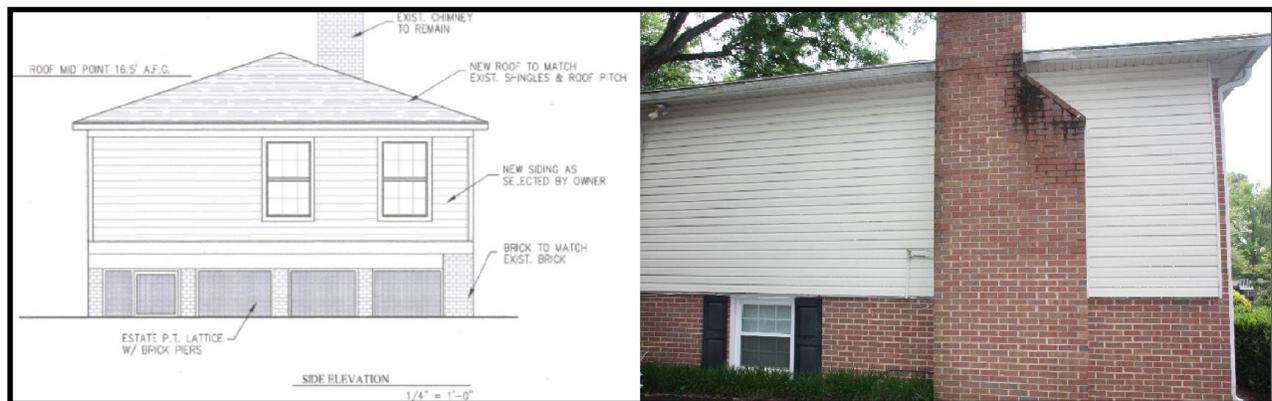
Side-view rendering of proposed addition with existing view on right. Source: Applicant.
